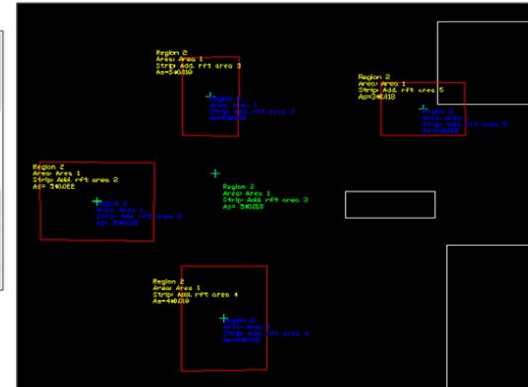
Exporting the detailing of the slab which shows the basic and the additional reinforcement values and locations
